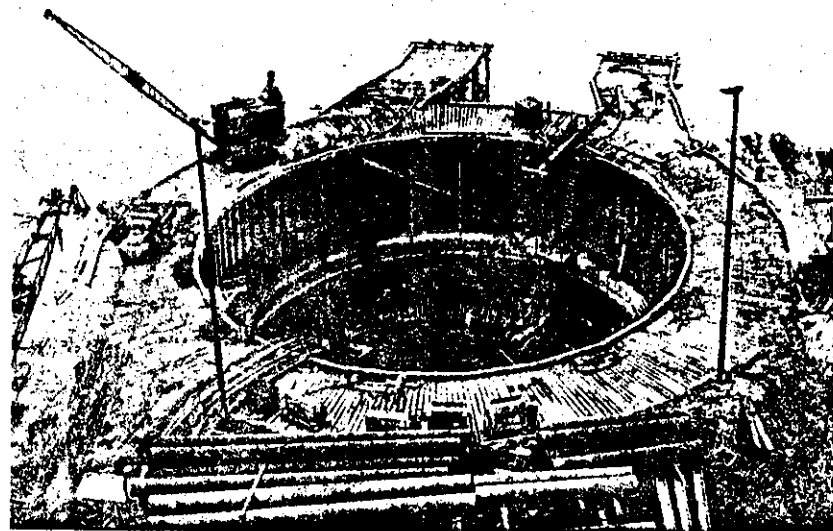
CAISSON FOR INTAKE STRUCTURE OF VENICE NO. 2 POWER PLANT. THE UPPER CONCRETE RING WALE IS IN PLACE AND THE LOWER ONE IS BEING FORMED.
